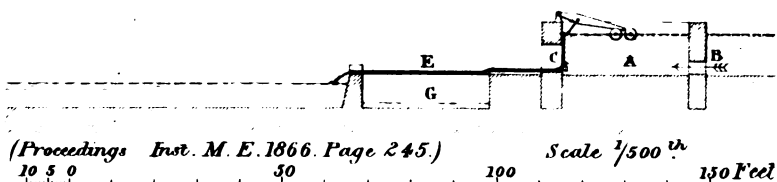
Longitudinal Section through Gauge Basin and Test Basin.
